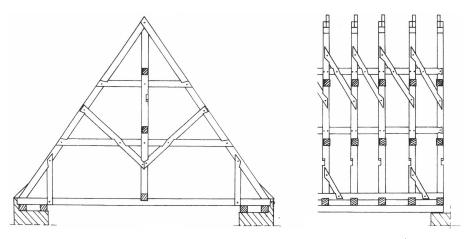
Construction joints of the roof structure of the church in Lubiszewo/Liebschau
